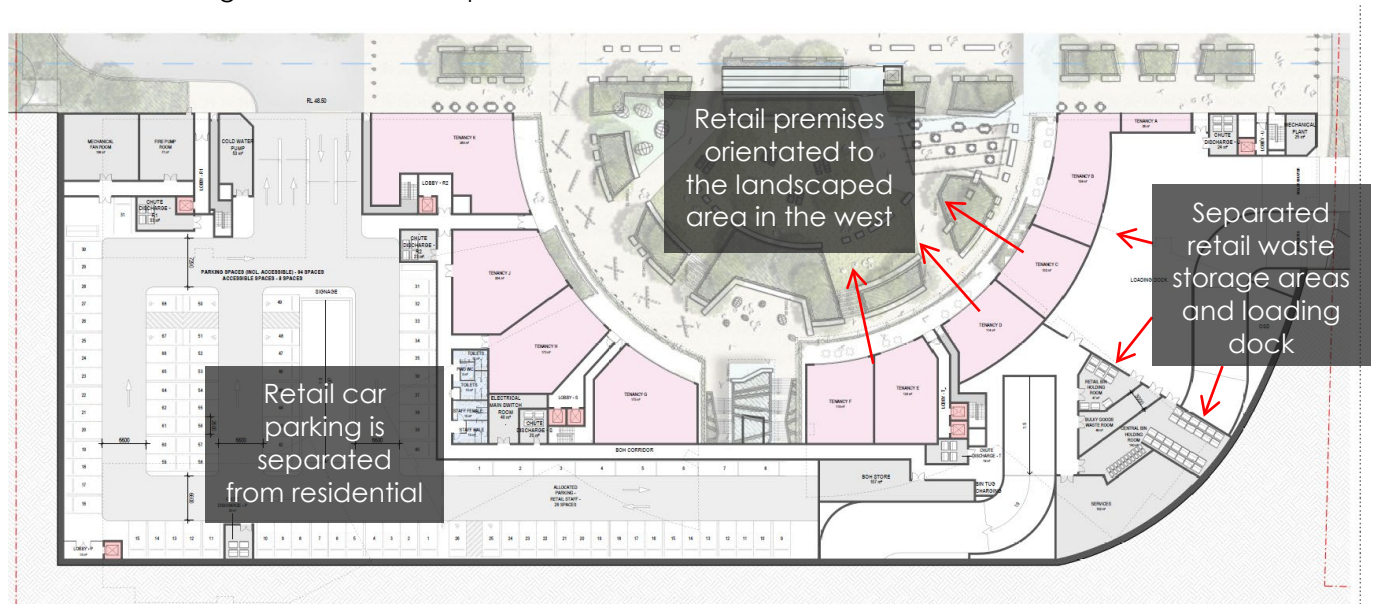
Extract from Building P-U Retail Level Plan [RL 50.70] (Source: Group GSA, 2025)
